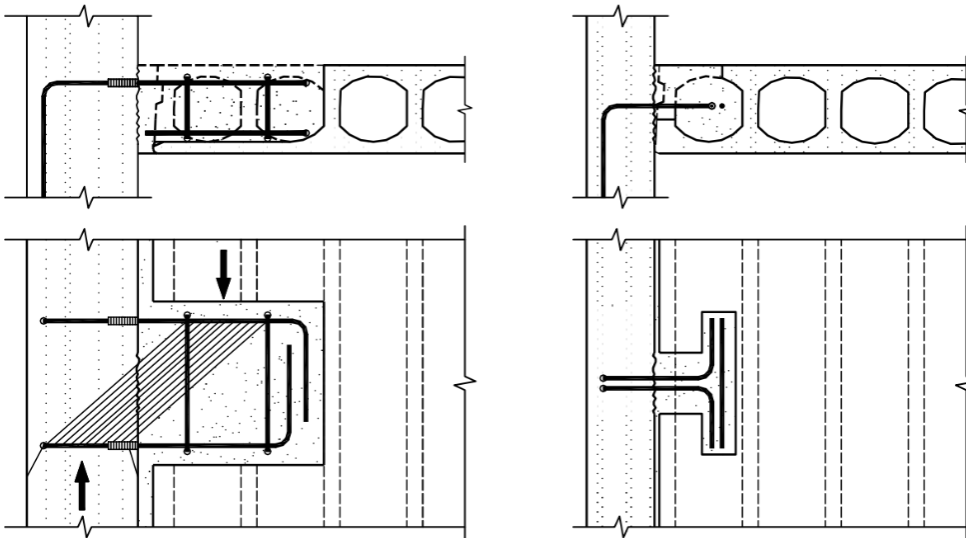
Examples of longitudinal connection between the Hollow Core (HC) and shear wall [2]
